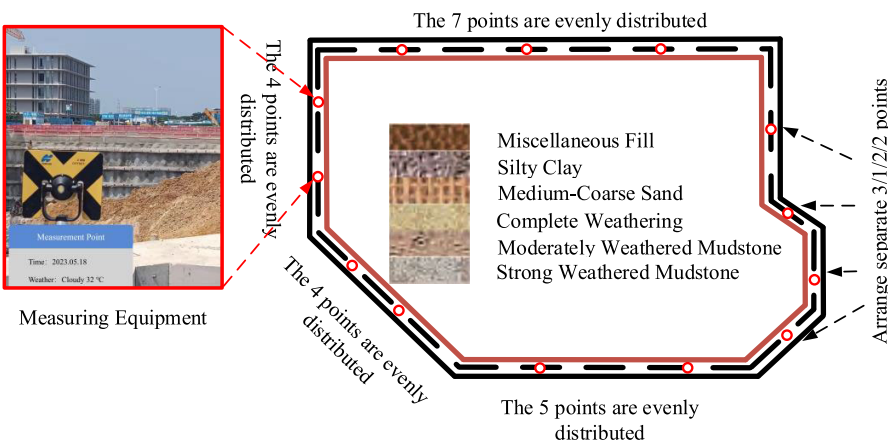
Plan of foundation pit and layout of inclinometer tubes.
